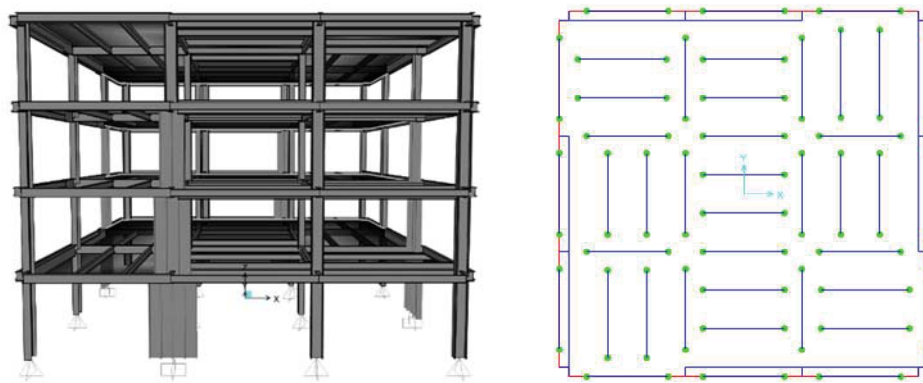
Proposed innovative structural configuration [MRF+LSC]: 3D view and floor layout (with connection characteristics for main and secondary beams)
